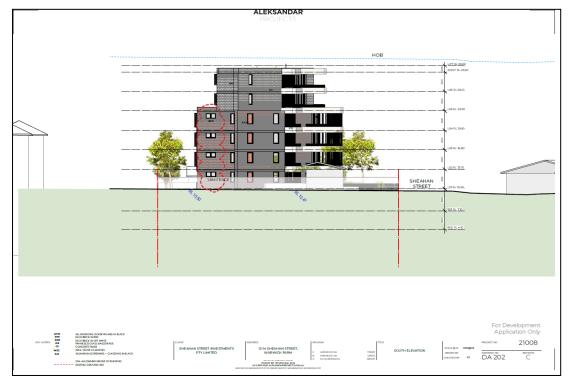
South Elevation Plan (Source: Aleksandar Projects)
